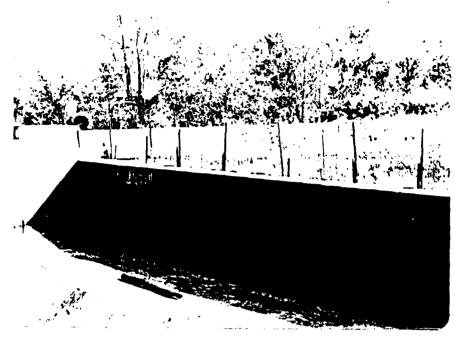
Picture of concrete overflow of service spillway taken from downstream of spillway.
